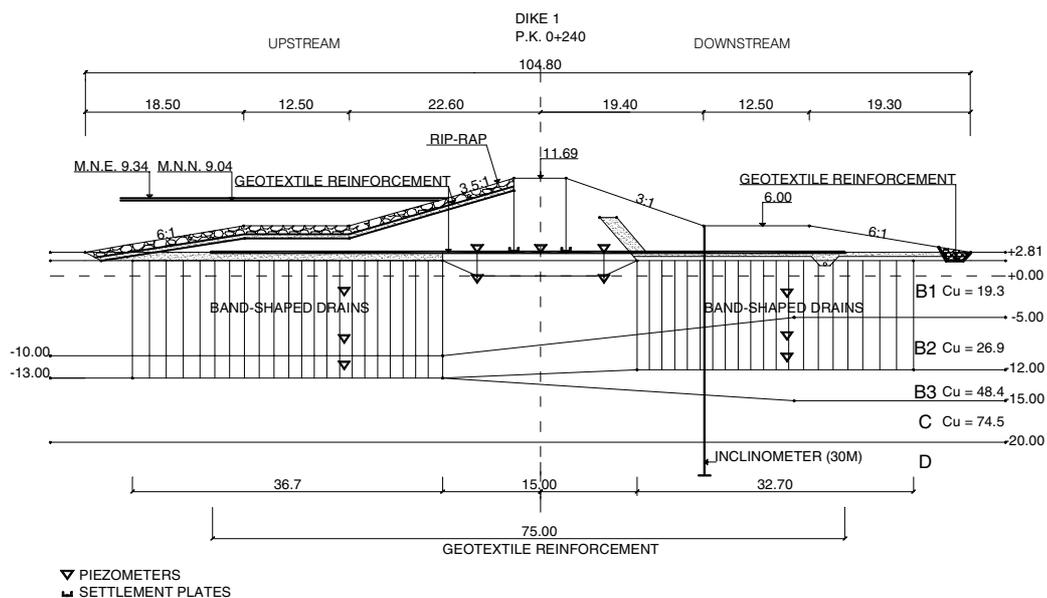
Final design of dike 1, showing instrumentation, reinforcement geotextile, band-shaped drains and the undrained strength of clay layers.
